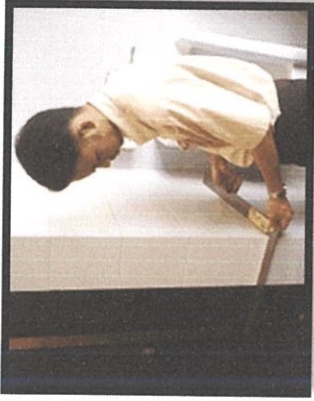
Checking the dimensions of a tread and rise of stair.
